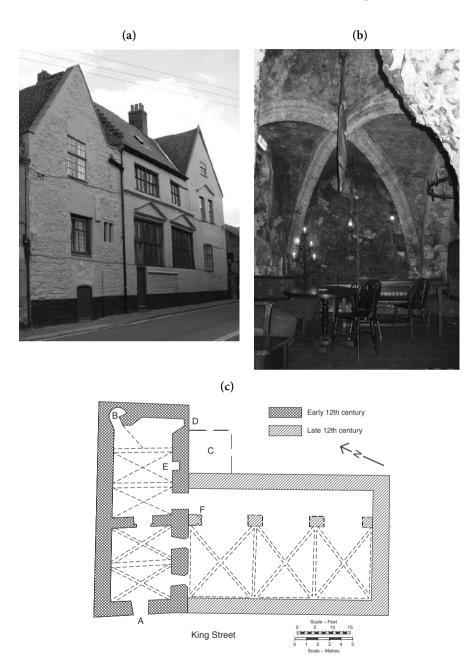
Norwich, the Music House. (a) King Street façade, showing early and late twelfth-century buildings; (b) Western chamber of undercroft, showing quadripartite vaulting with roll-moulding; (c) Plan showing early and late twelfth-century buildings
